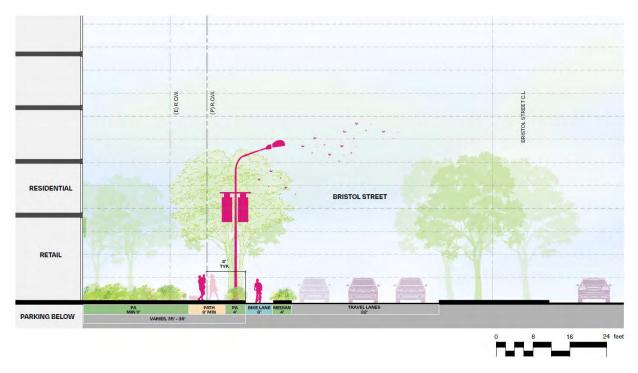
Typical Streetscape Section B (Bristol Street with Floating Bus Stop)
